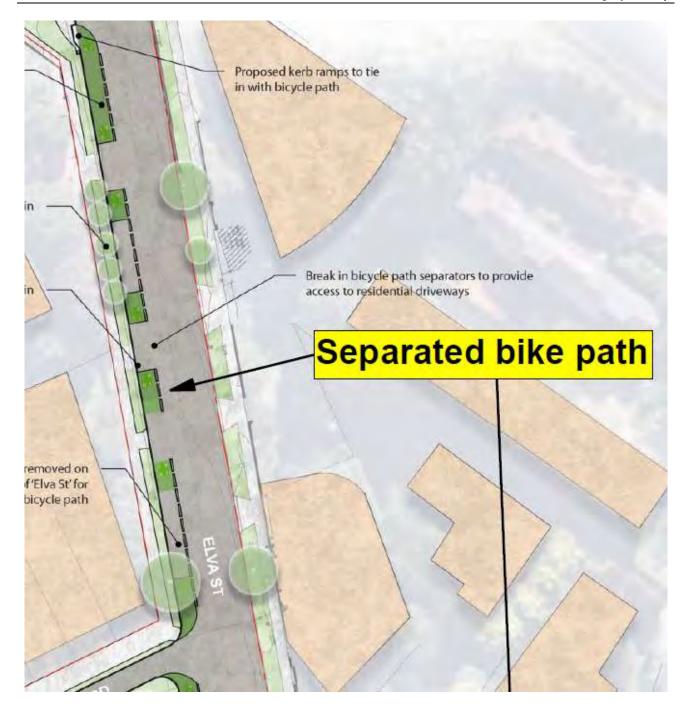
Section 3 Part V of the HMaPP between Elva Street and Albert Road
